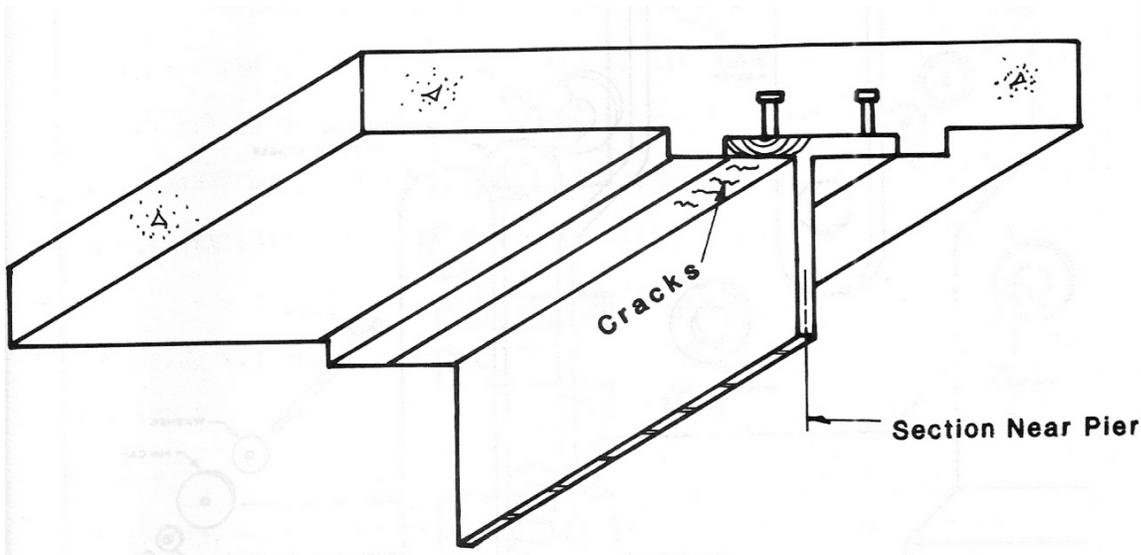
Composite section cracks from studs (FHWA 1986)
